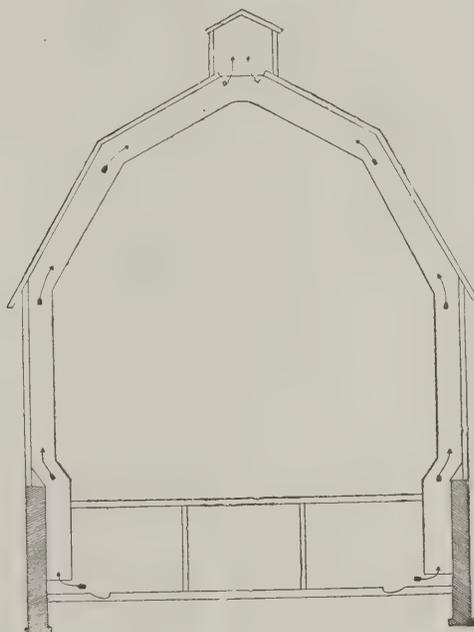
Vertical Cross Section of Barn Showing Foul Air Flues
